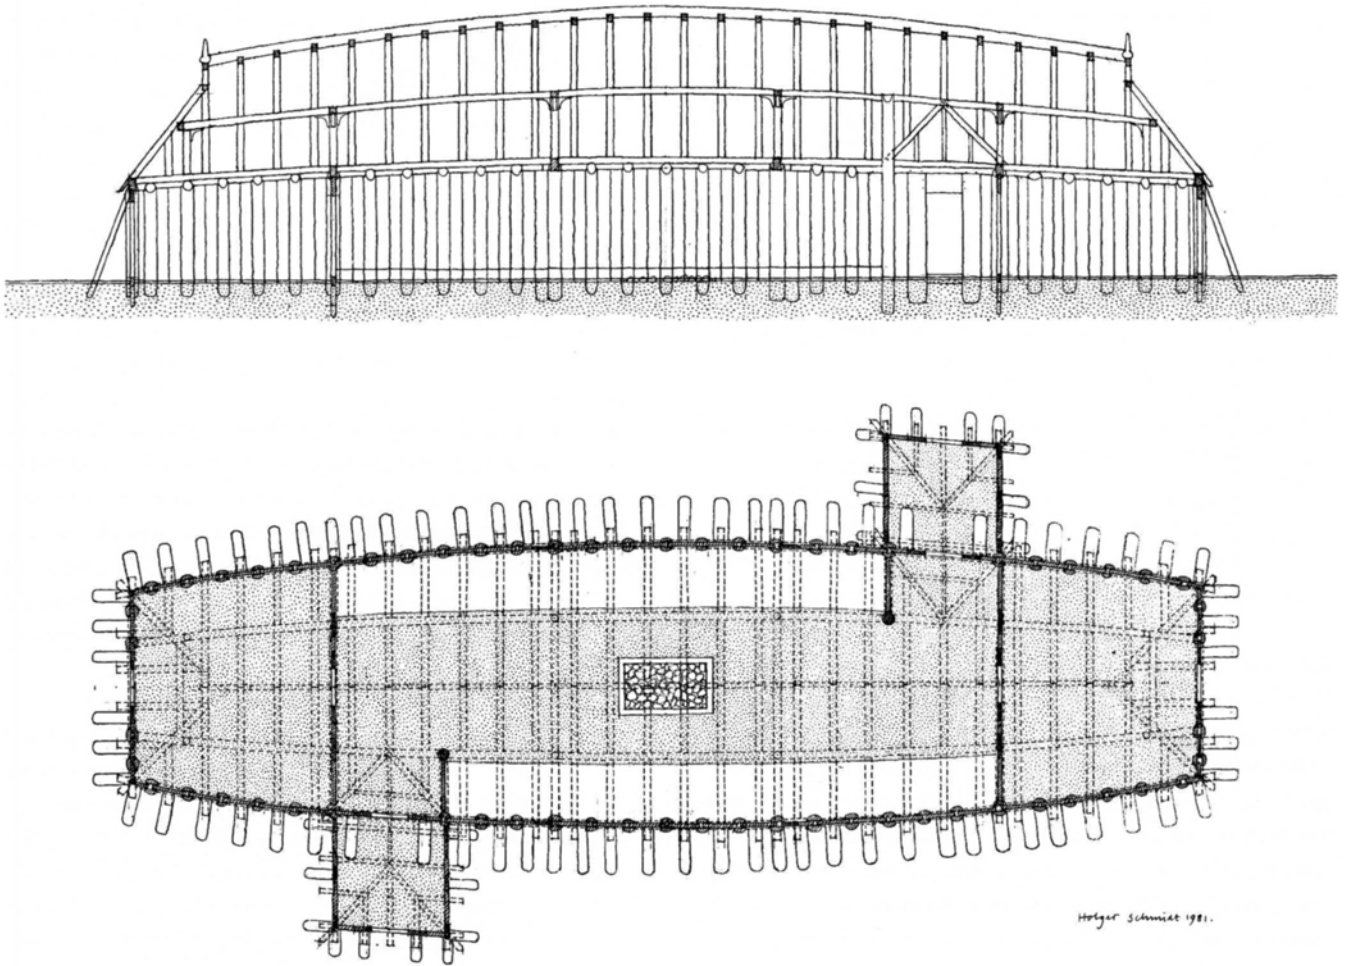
Reconstruction of a house from the Fyrkat fortress built about A.D. 980. Section and plan, 1:200. H.S. 1981–82.
